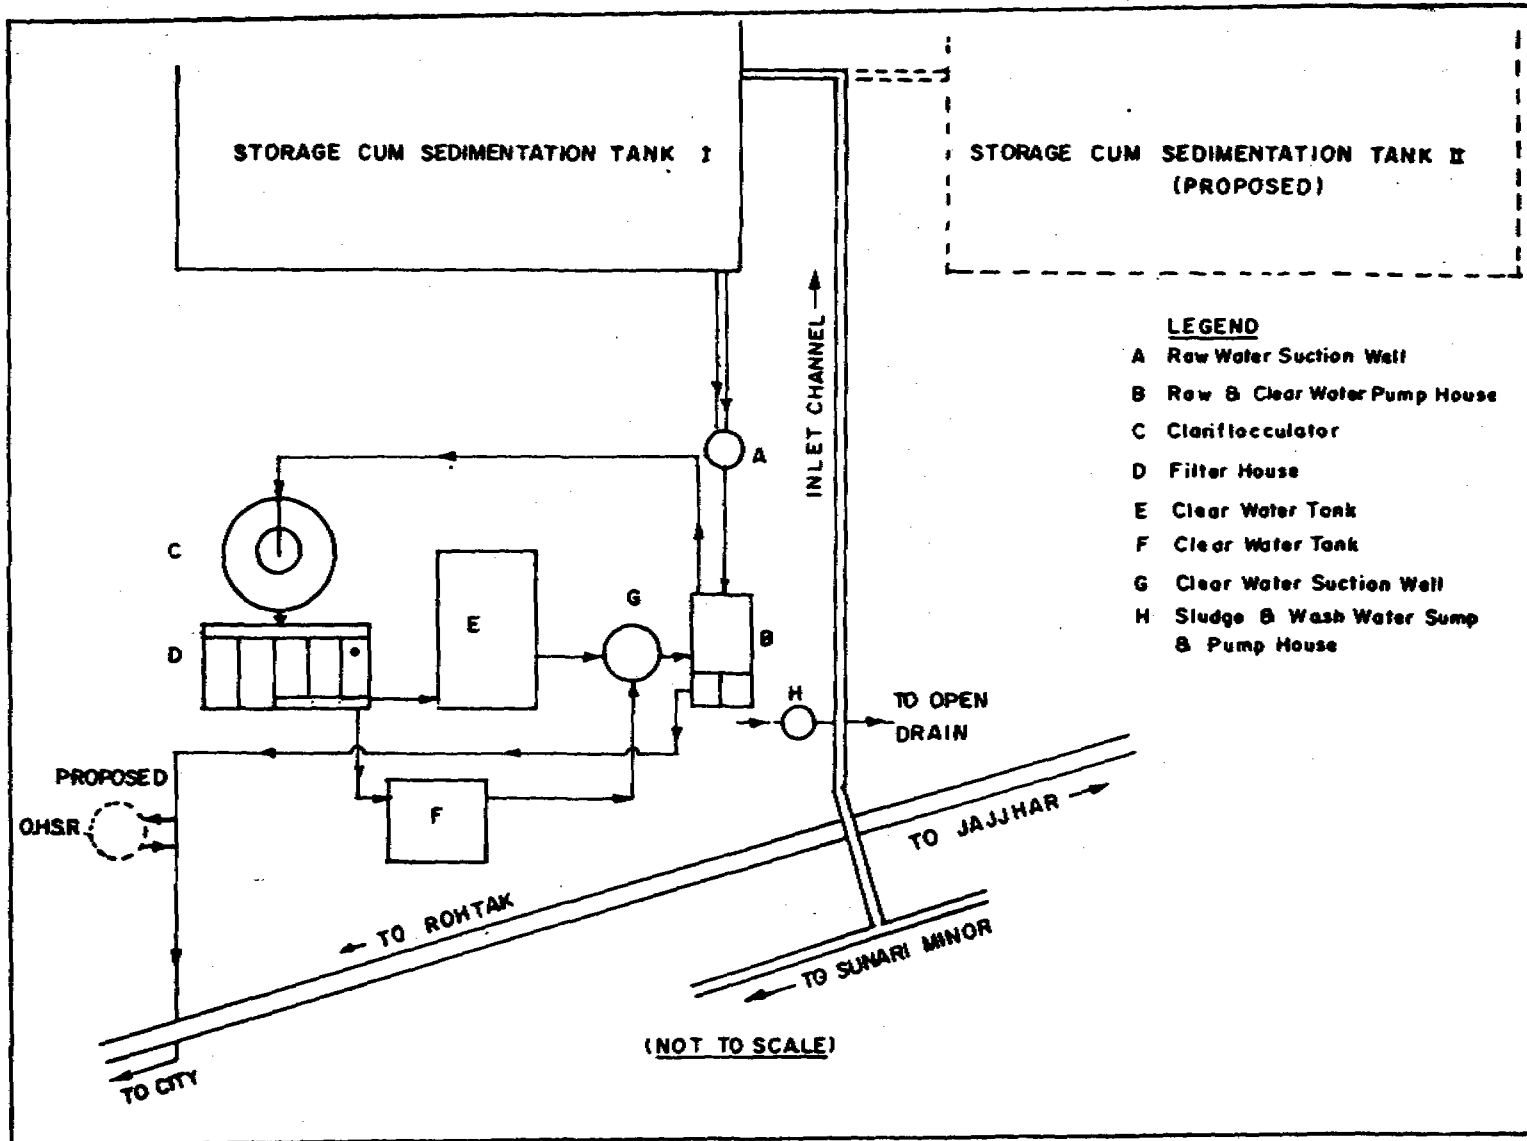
LAYOUT PLAN OF PHED SECOND WATER WORKS, ROHTAK
